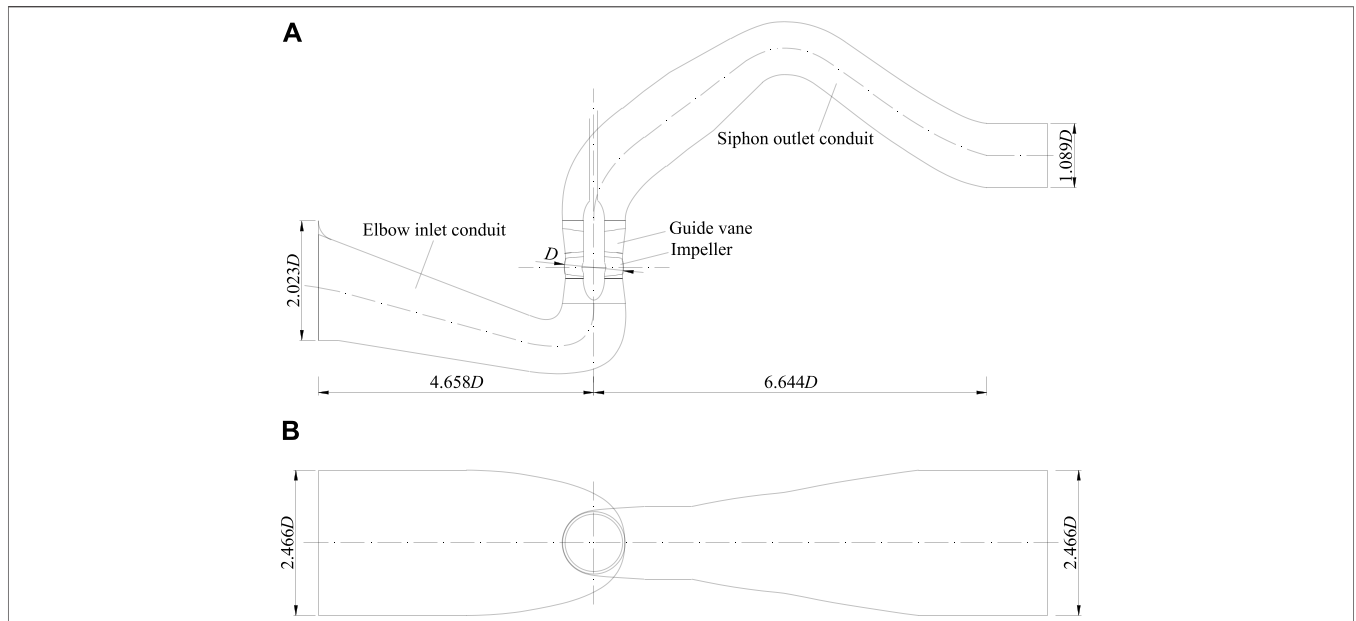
| Drawing of the vertical axial-flow pump device. (A) Elevation, (B) Plan.
